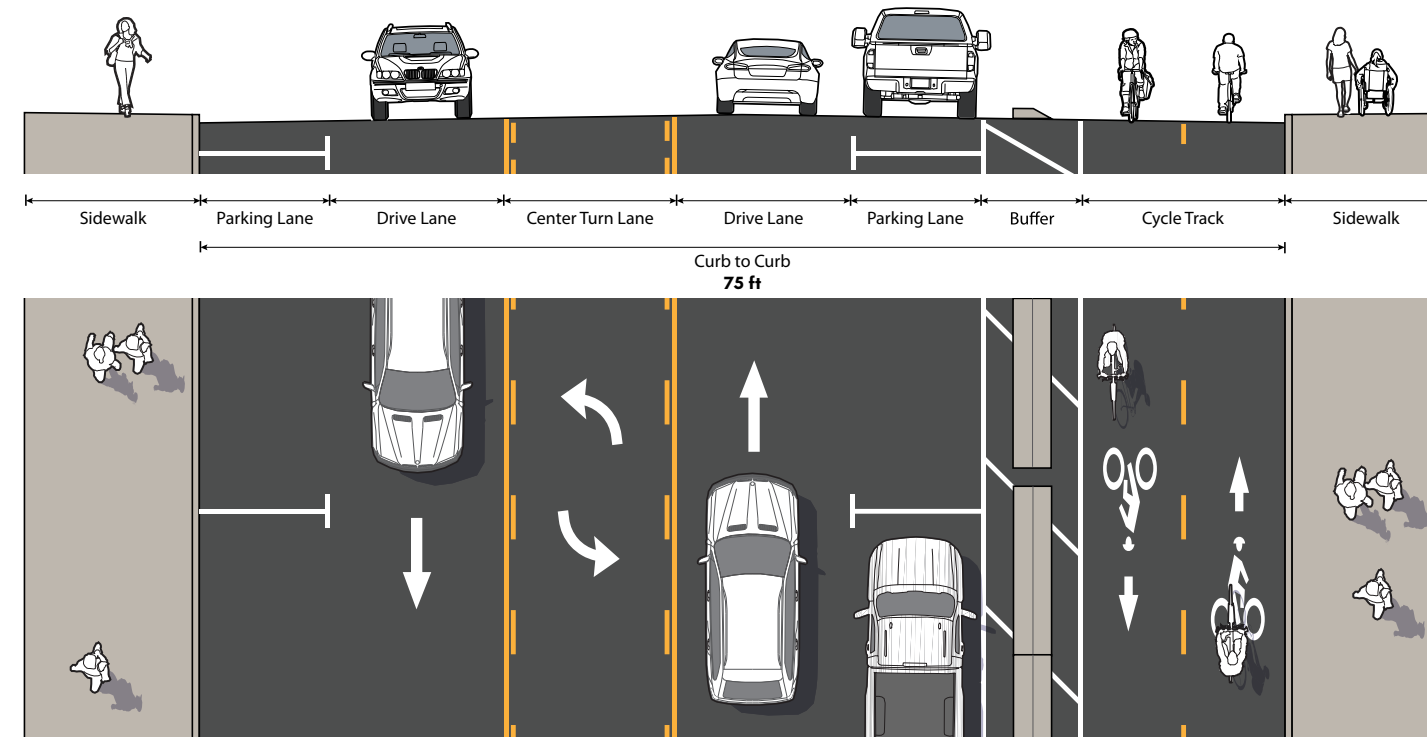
Design Option Two: Road diet with separated, bidirectional bike lane section west of Cleveland Avenue (looking east)
